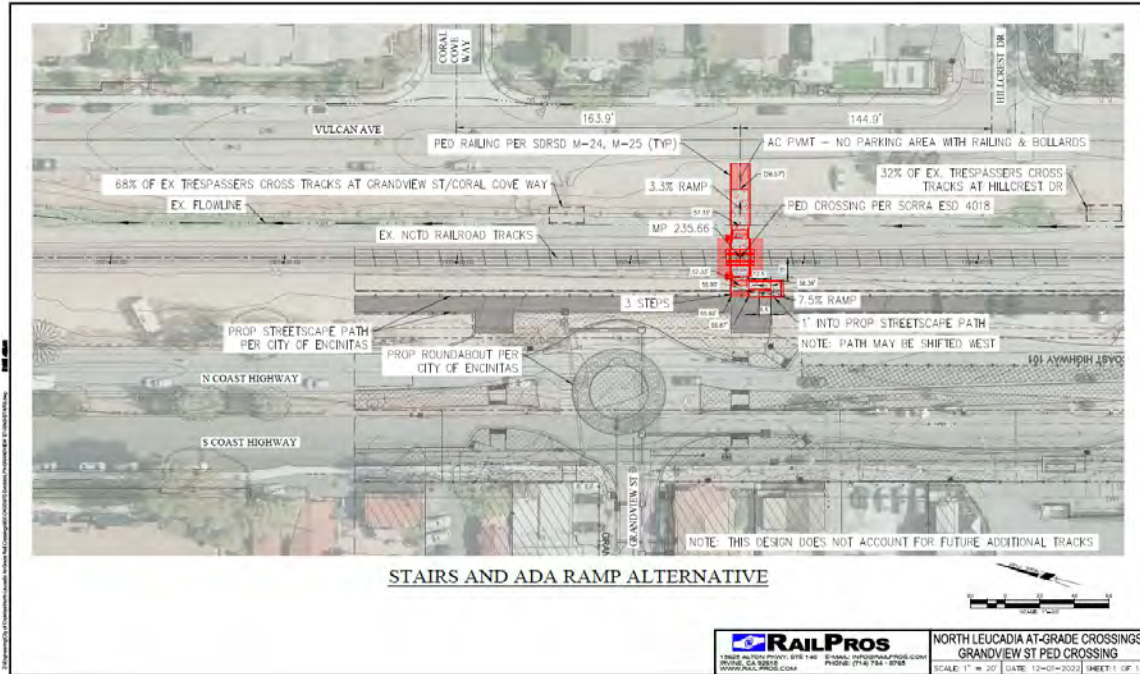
Grandview Street Crossing Stairs and Ramp Alternative
